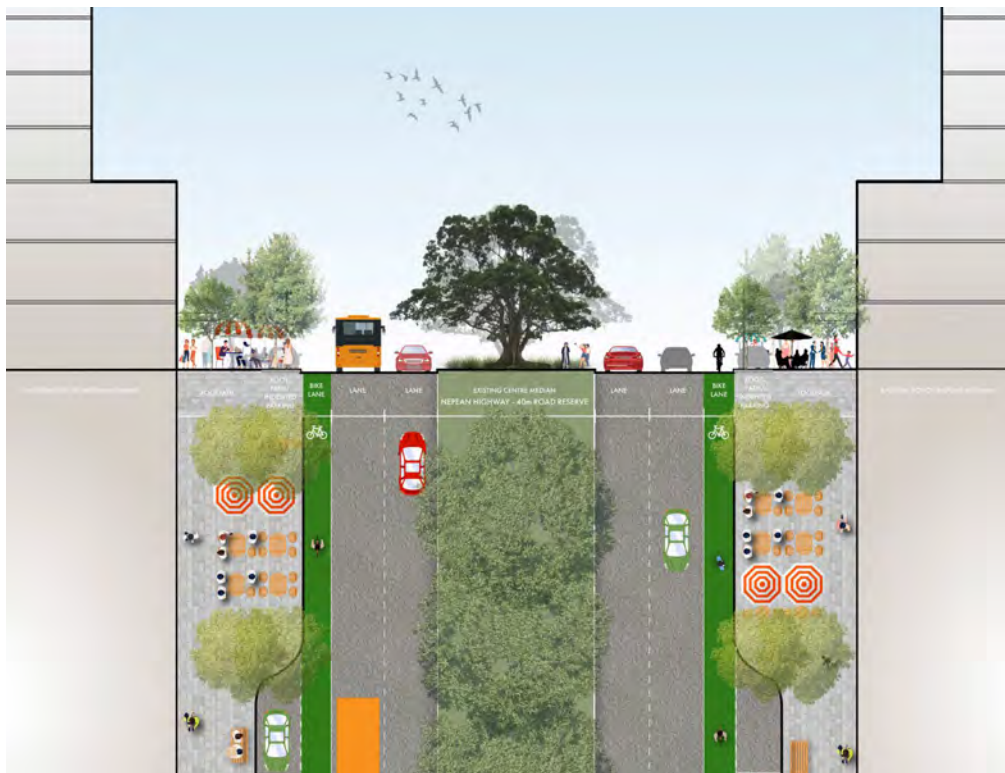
Example plan and cross section showing how Nepean Highway could be transformed.
